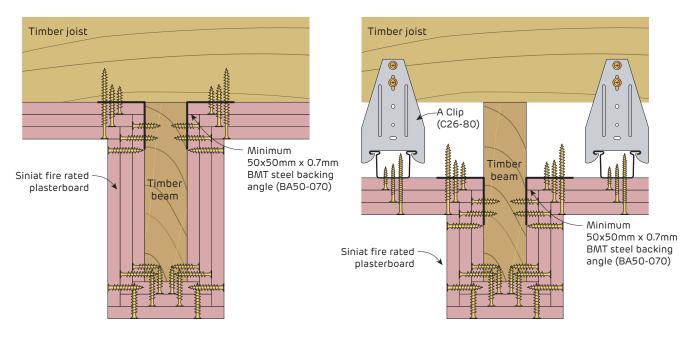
3 Sided Protection for Timber Beam to Ceiling Section
